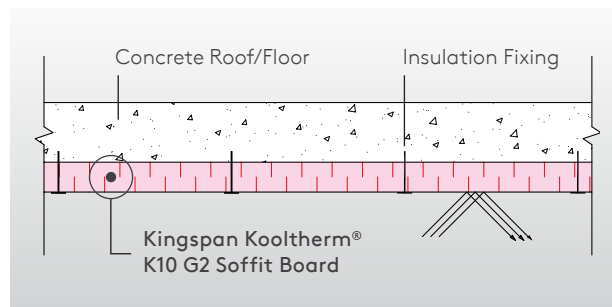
Side elevation - Concrete Soffit with Kooltherm K10 G2 Soffit Board.
